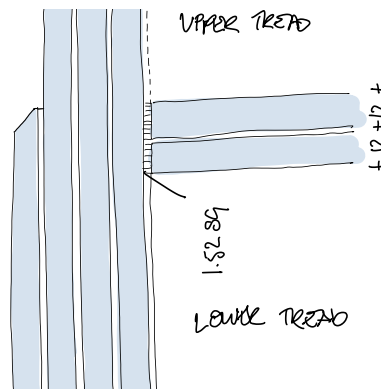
Horizontal sketch detail at stringer ply step. Riser bonded to stringer with SG
